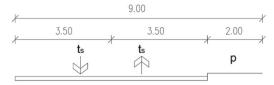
Geometrical cross-section of Partizanska street North [source: Author]
